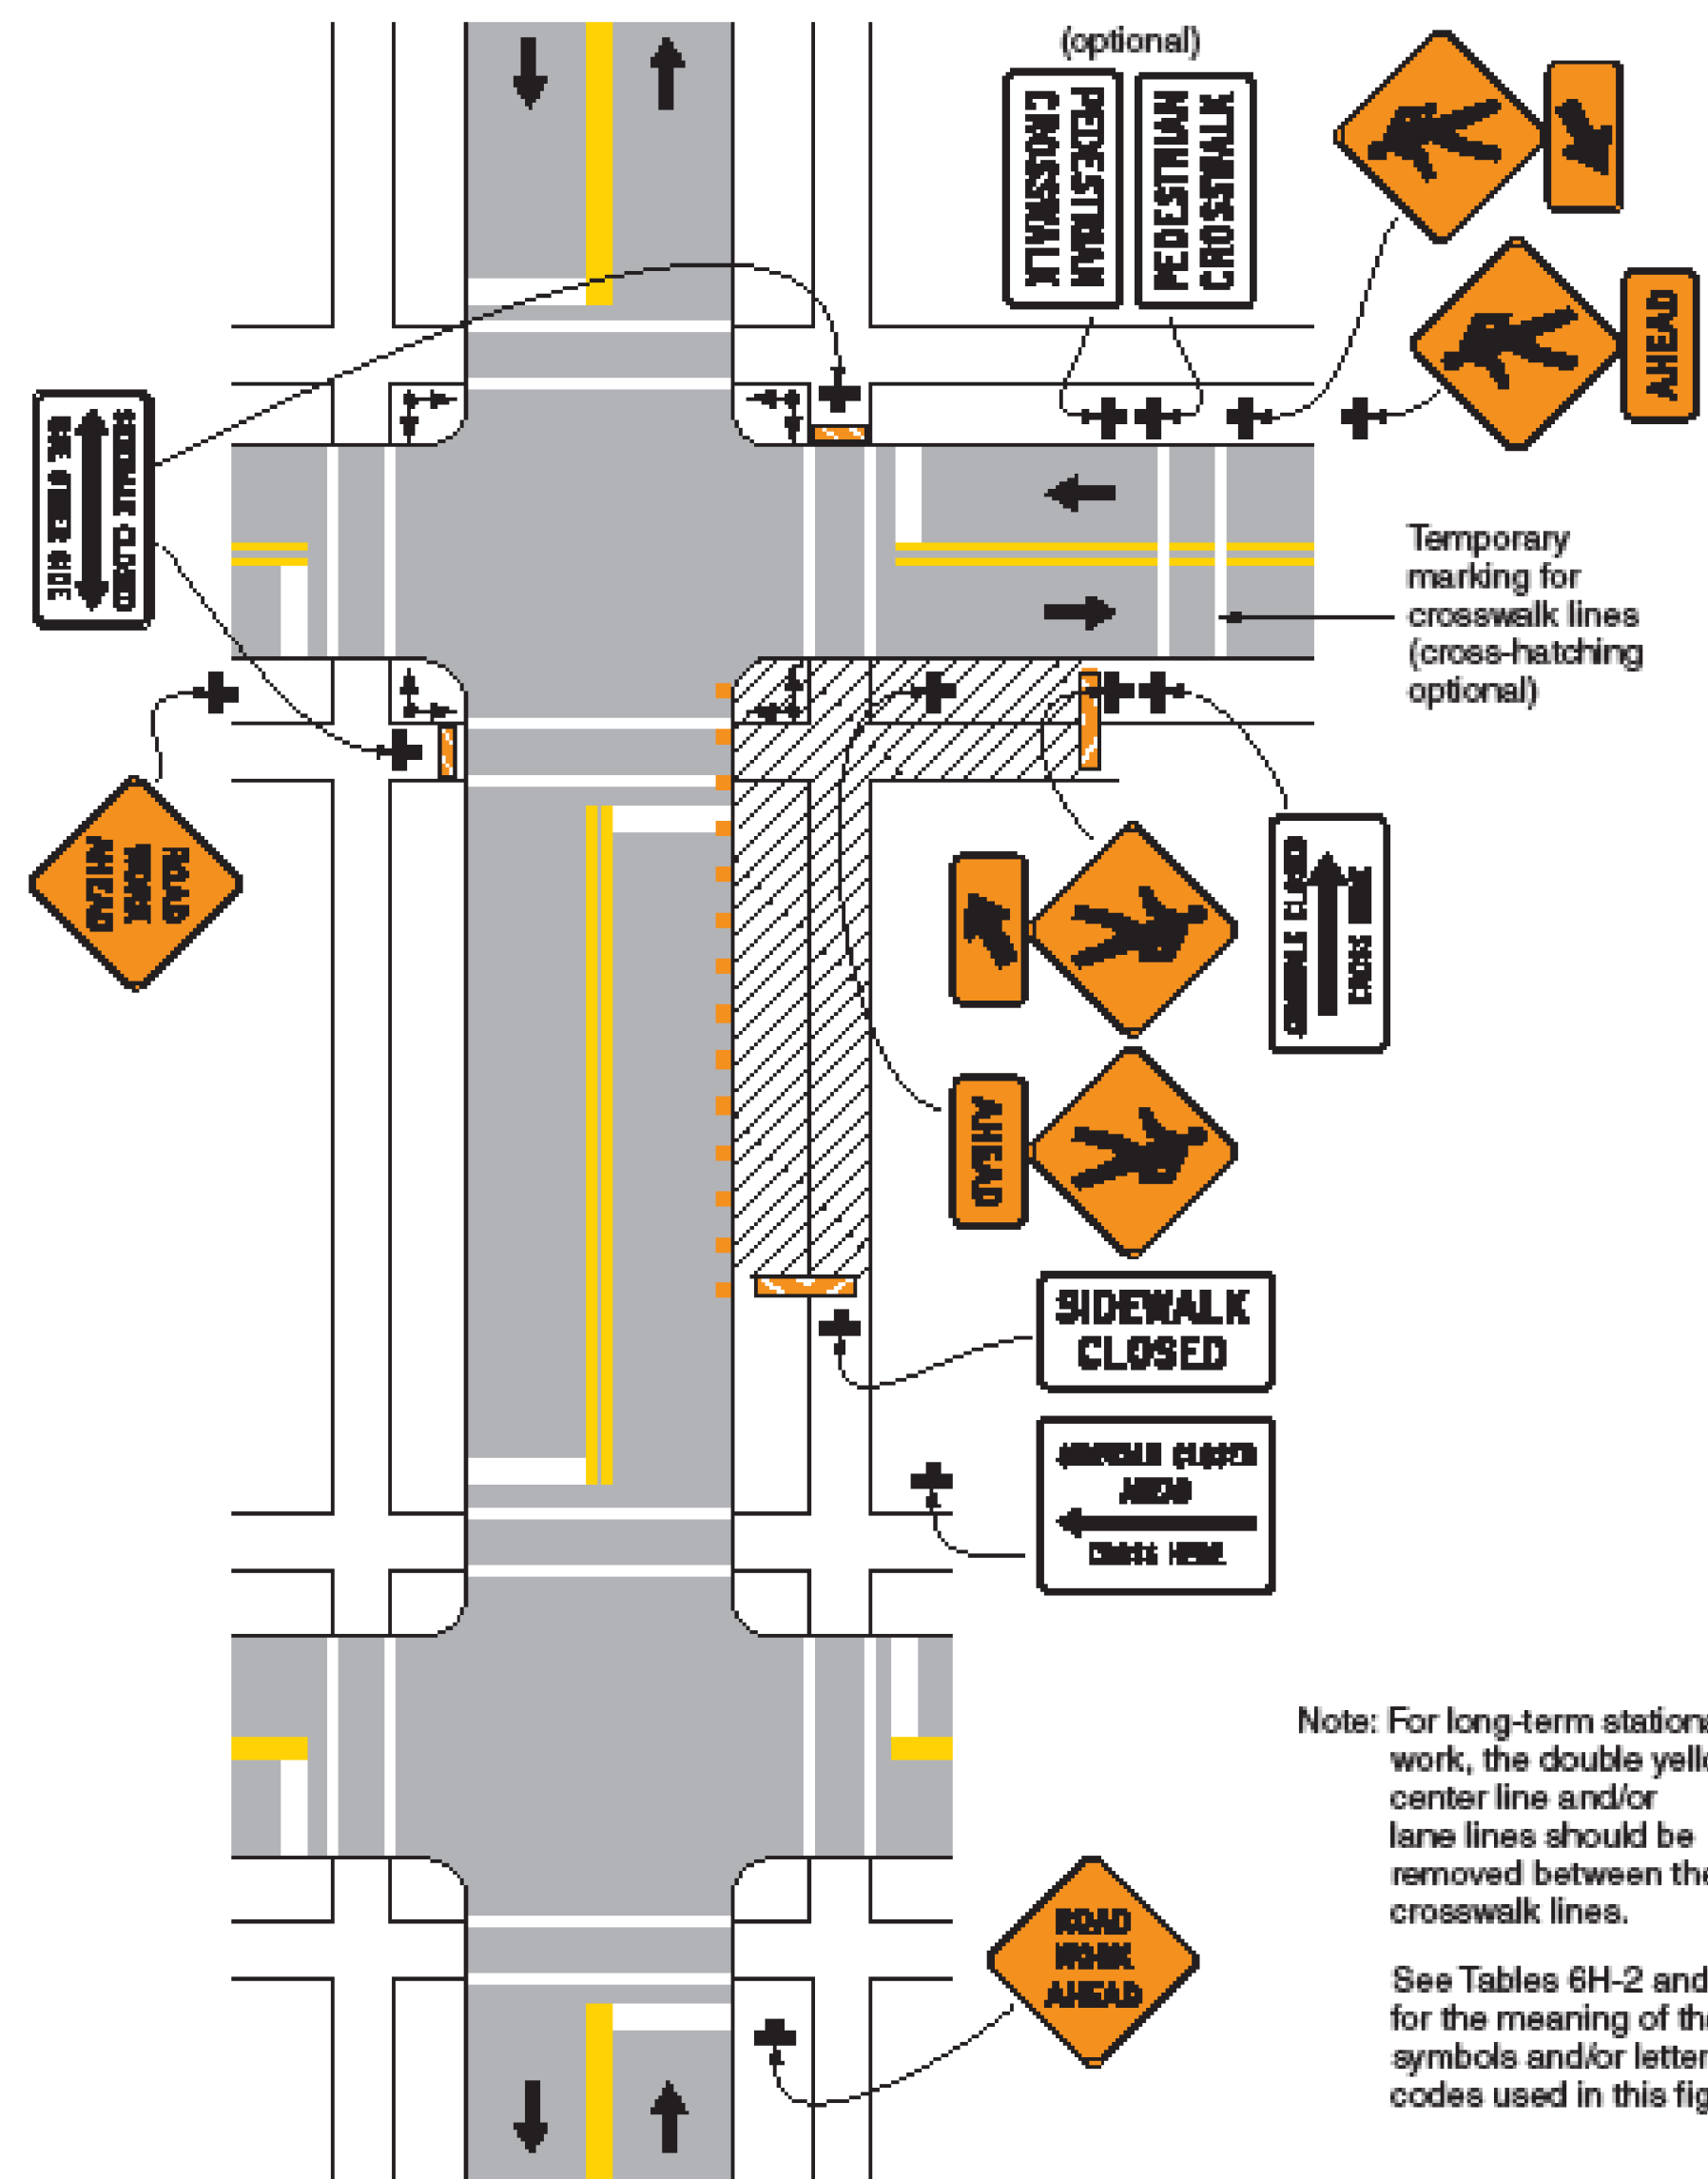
H-28. Sidewalk Detour or Diversion (TA-28)
